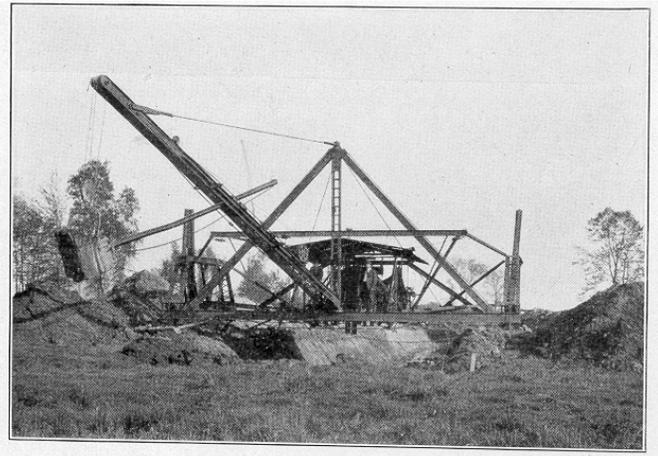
Land type of dredge constructing open ditch ten feet deep and twelve feet bottom width.
